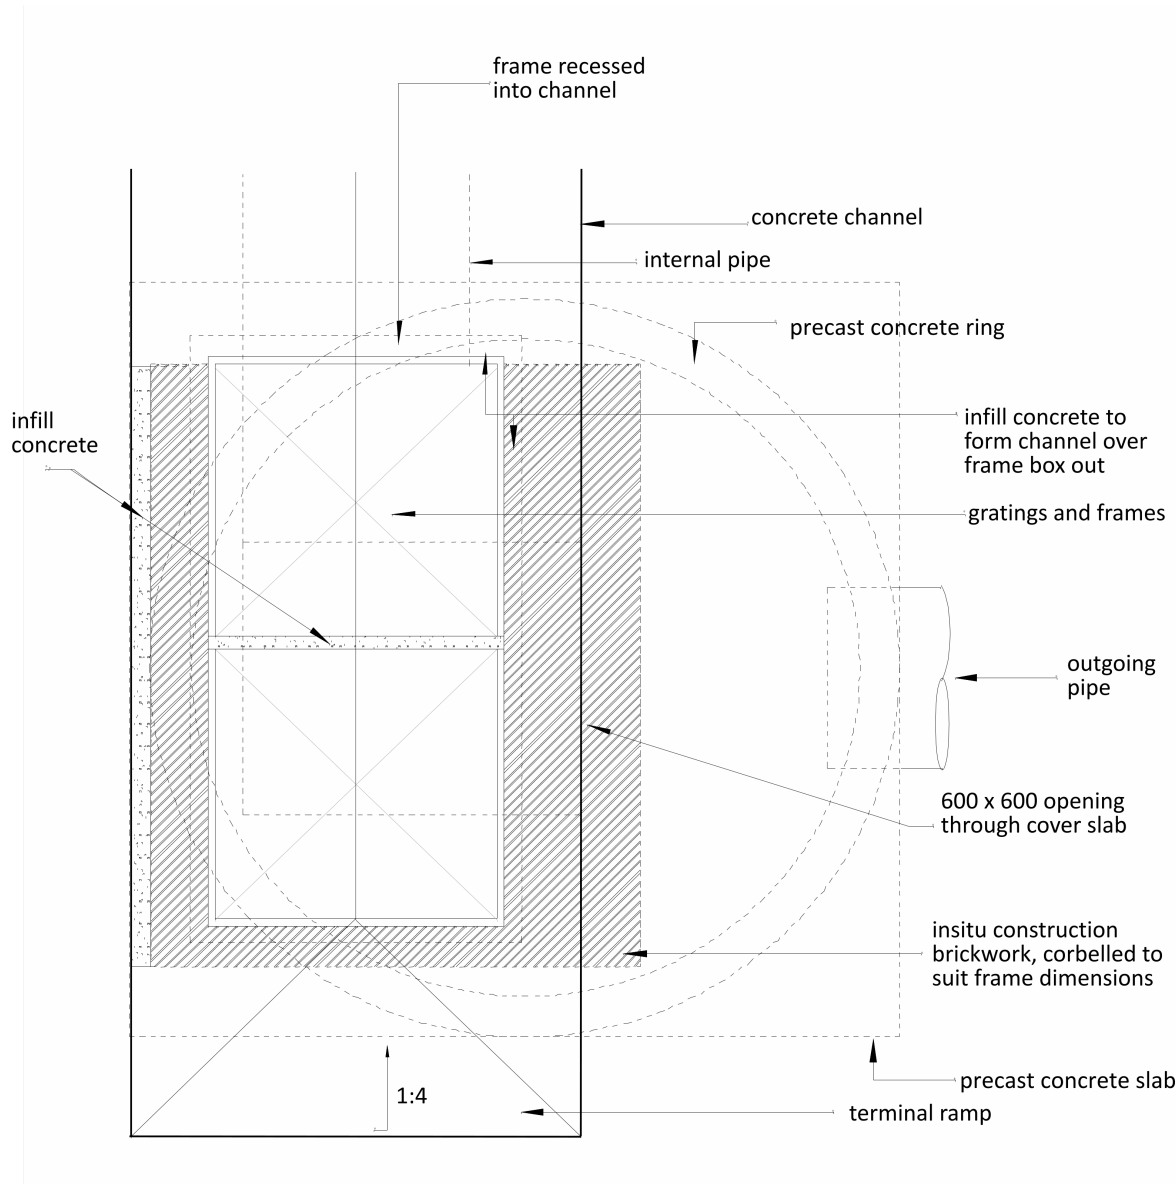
Example of combined channel and pipe terminal outlet - longitudinal cross section (dimensions in mm)
